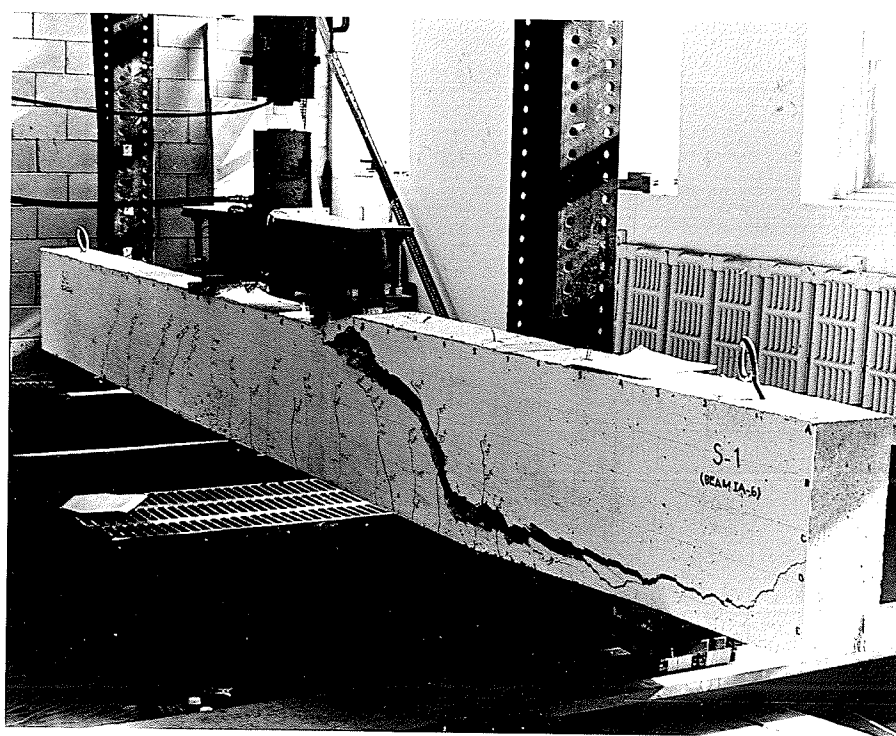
CRACKING PATTERN AND FAILURE OF BEAM IA-6
